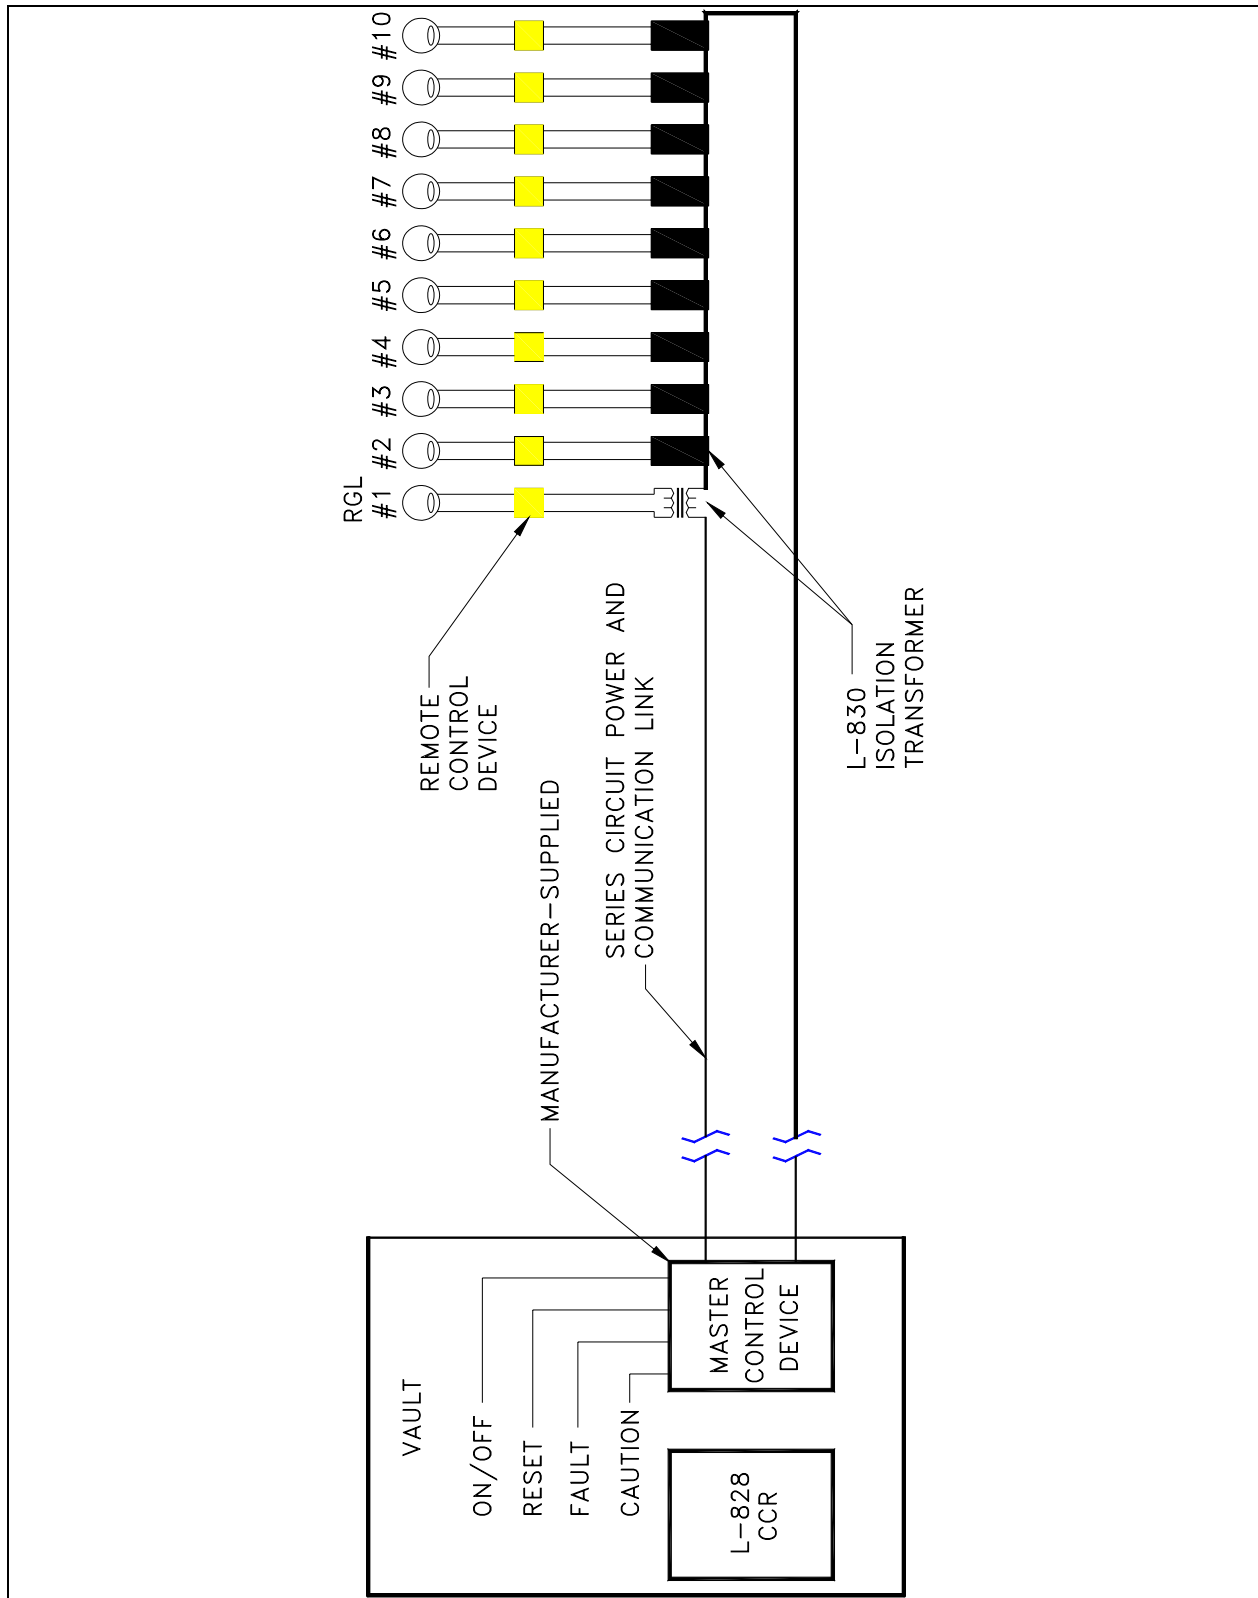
Typical In-Pavement RGL External Wiring Diagram – Power Line Carrier Communication, One Light Per Remote
